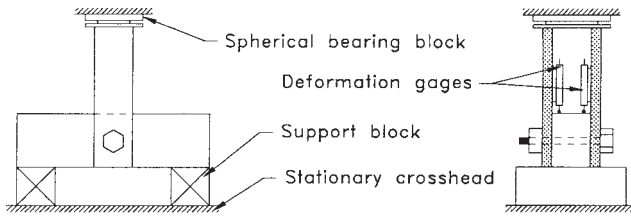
Assembly for Testing Bolted Connections Perpendicular to Grain in Compression
